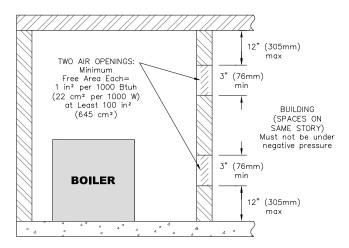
Air Openings – All Air from Indoors on the Same Floor
